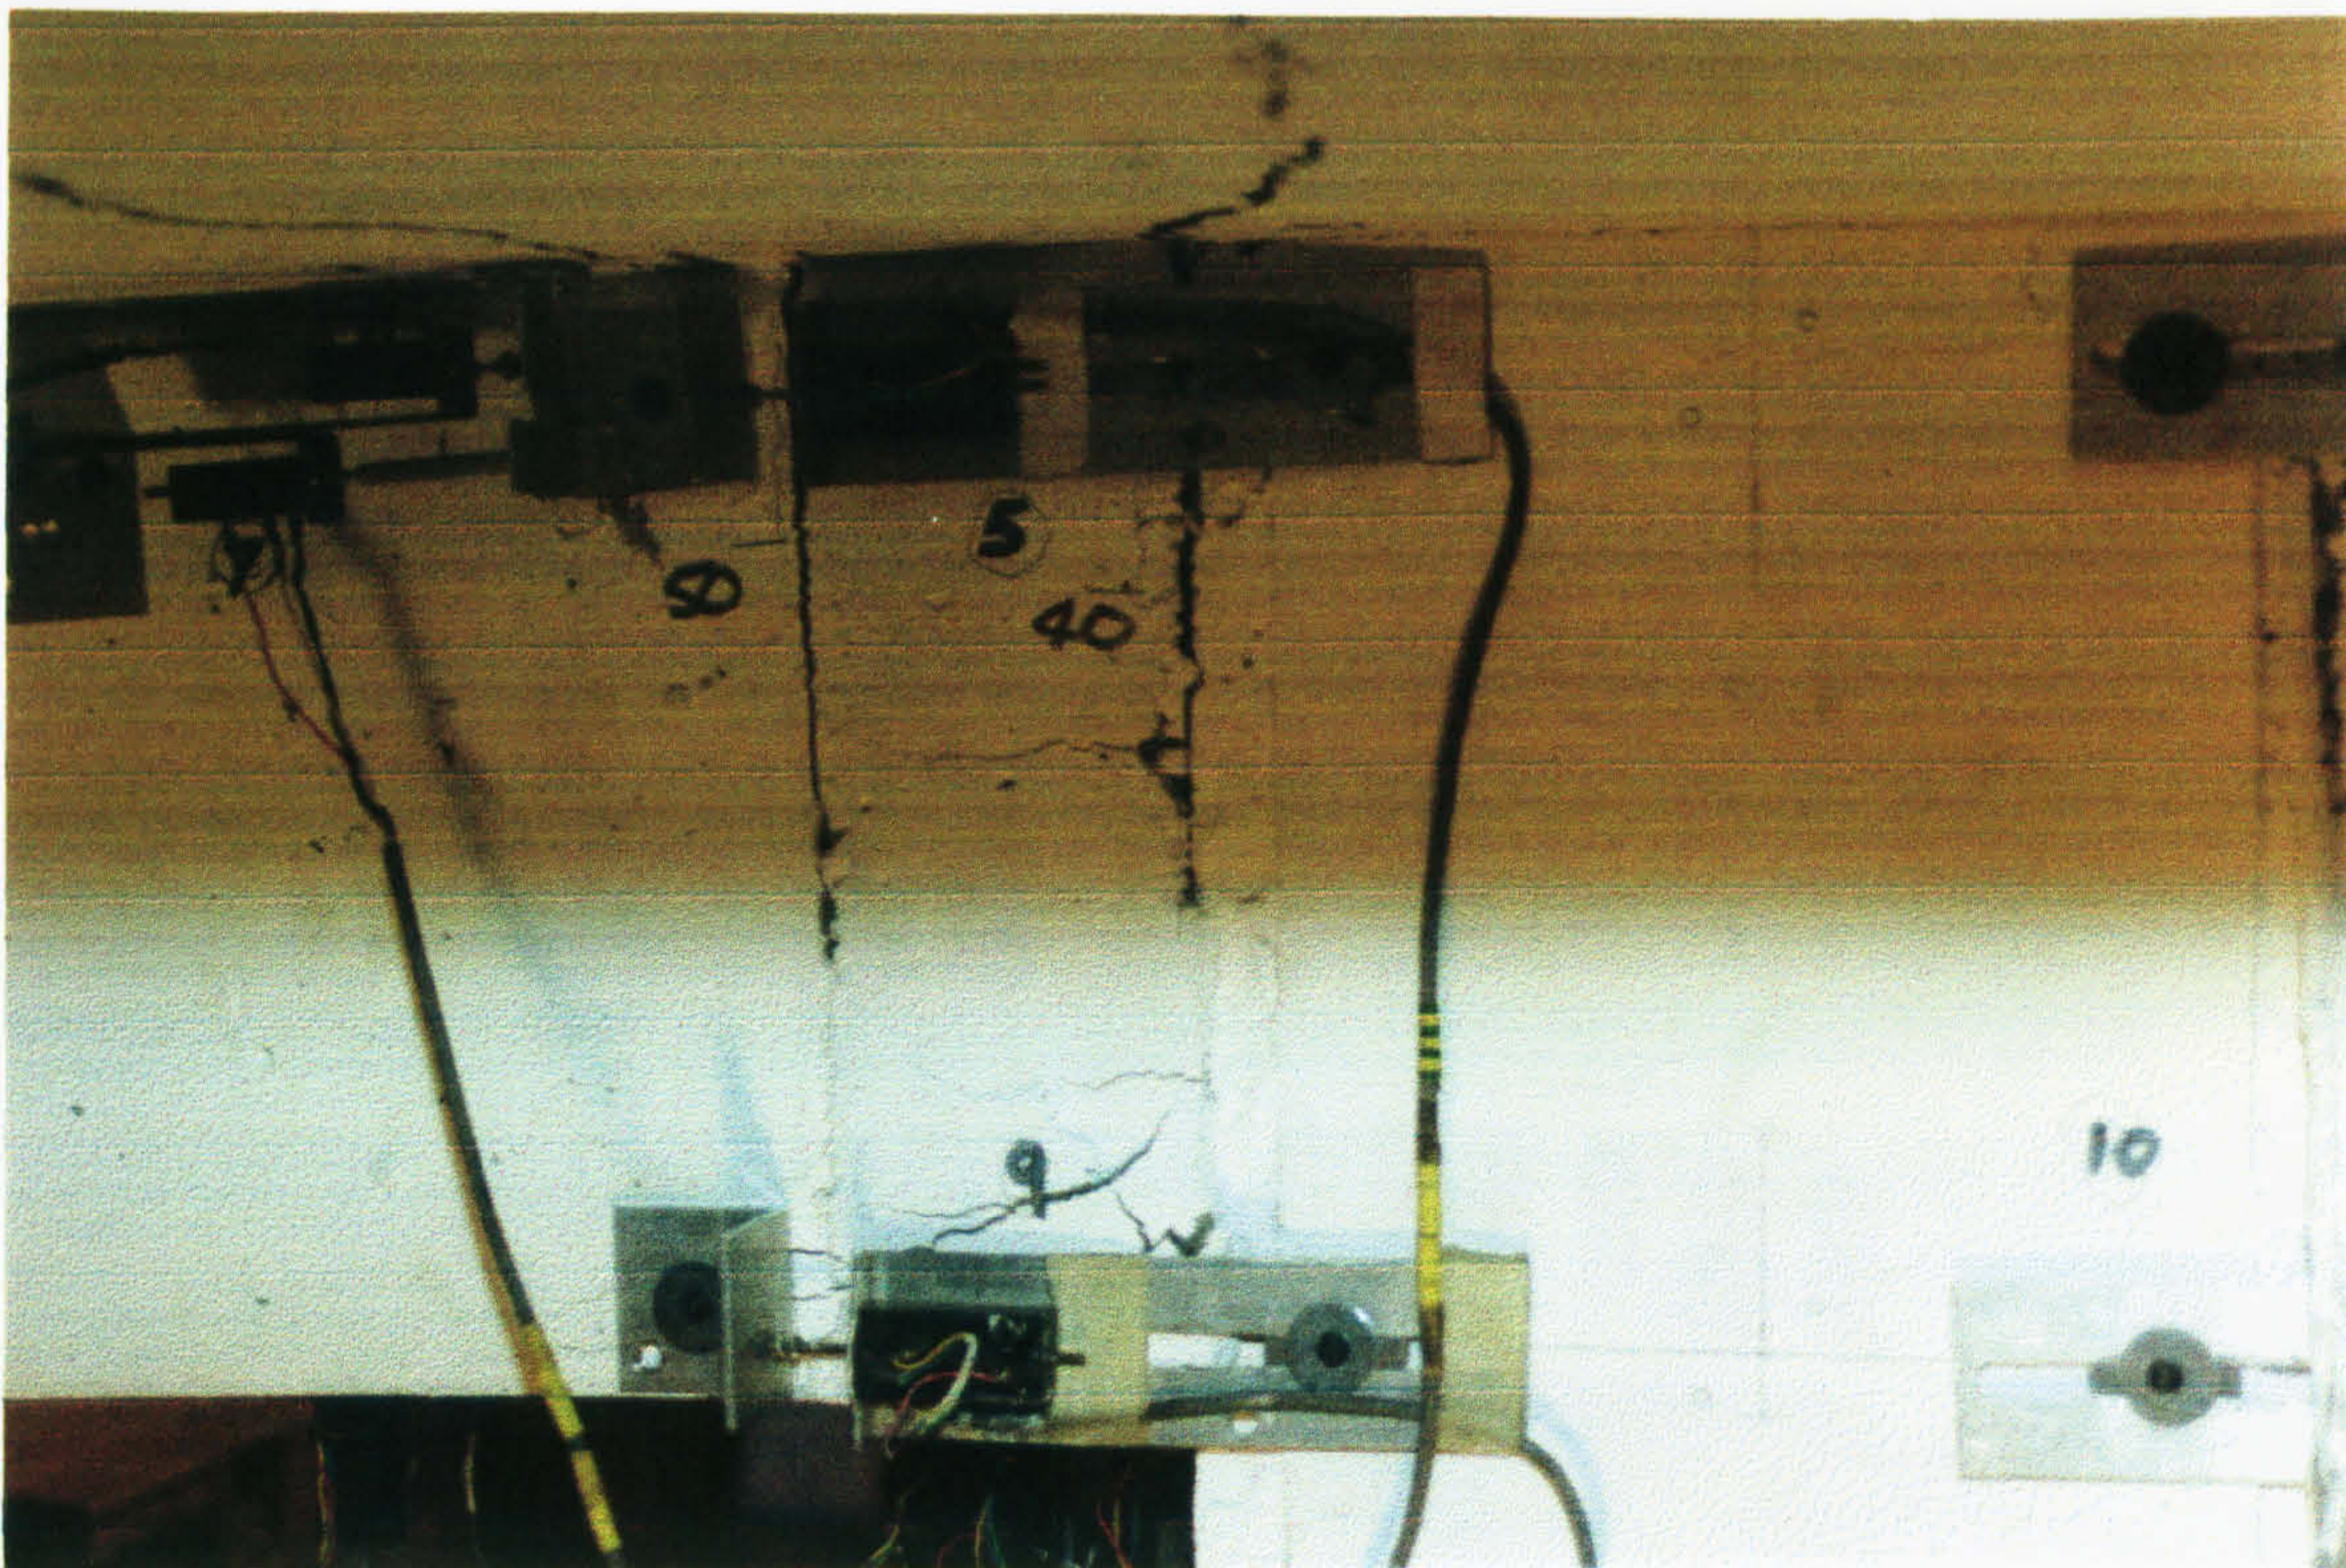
Failure region of beam 2-column joint from East in TW1(A)
